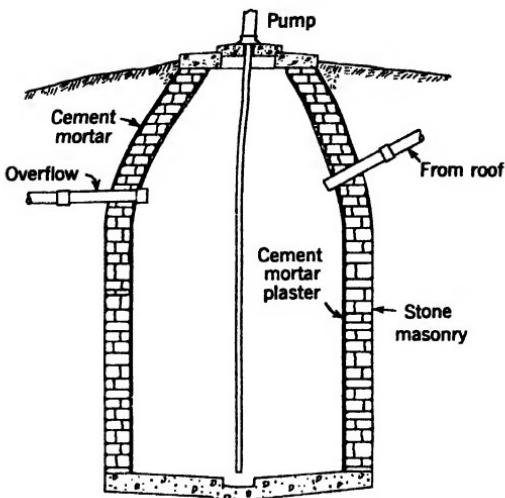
An underground cistern walled up with stone or bricks and plastered with cement mortar. It is good practice to coat the outside of the wall near the top with tar to help keep out surface water. This type of cistern is suitable for use at a barn, or to supply soft water for the hot-water side of a plumbing system, provided it is filled only with clean water.
